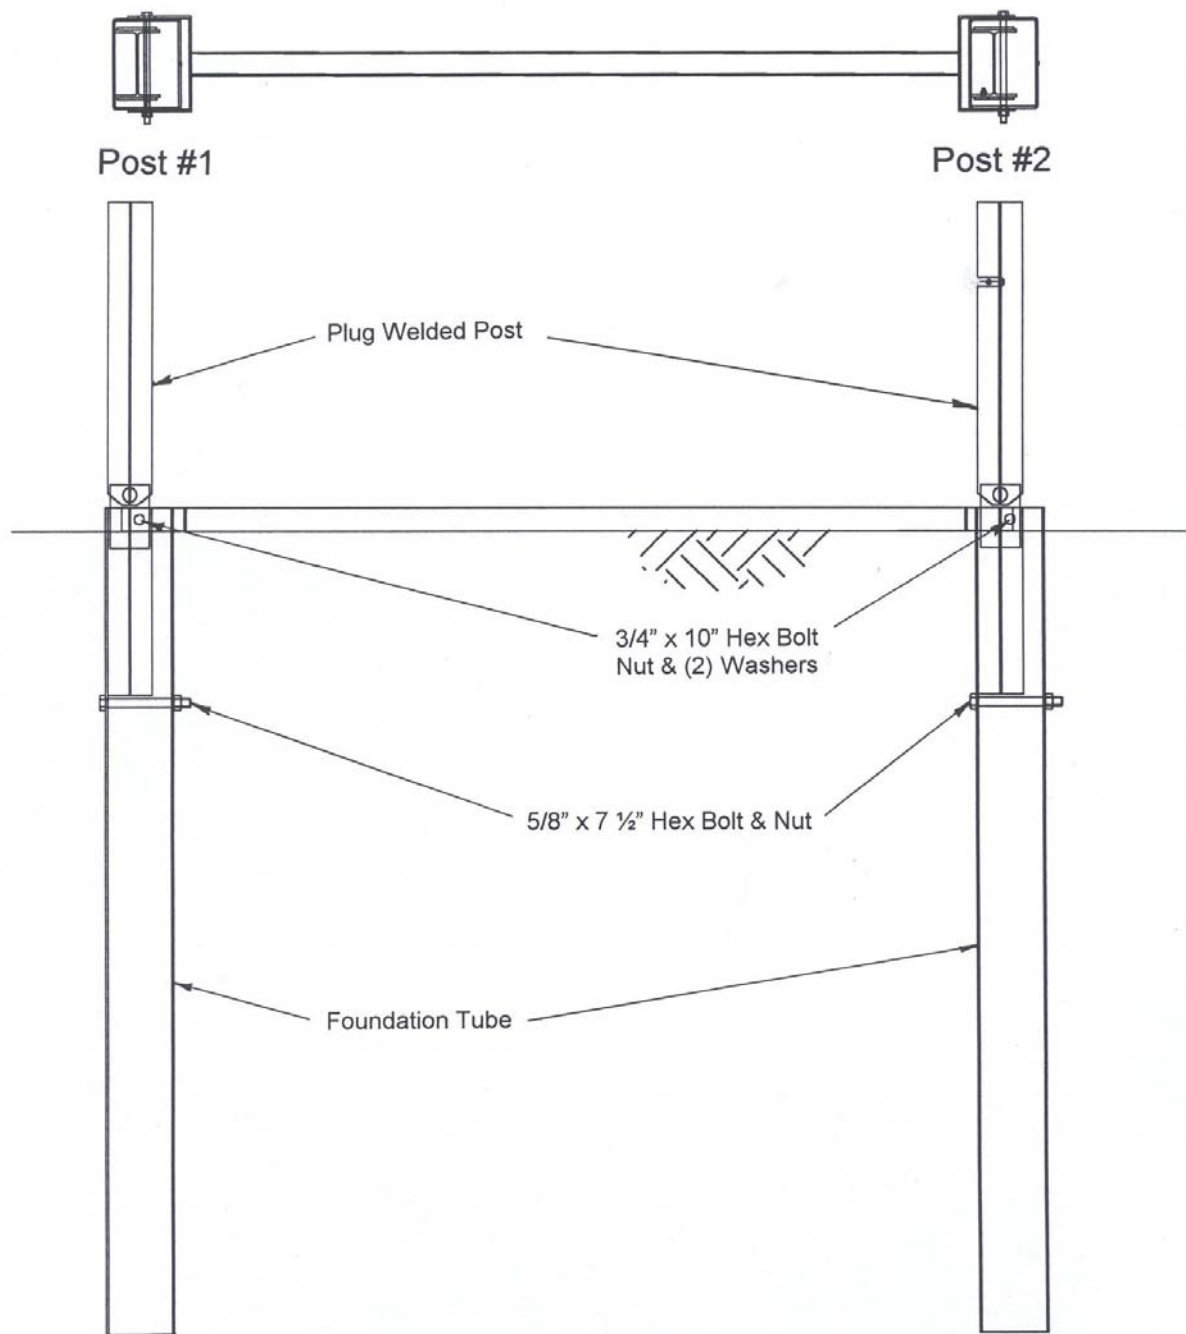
SKT Ground Strut Anchorage for Plug Welded Steel Post
